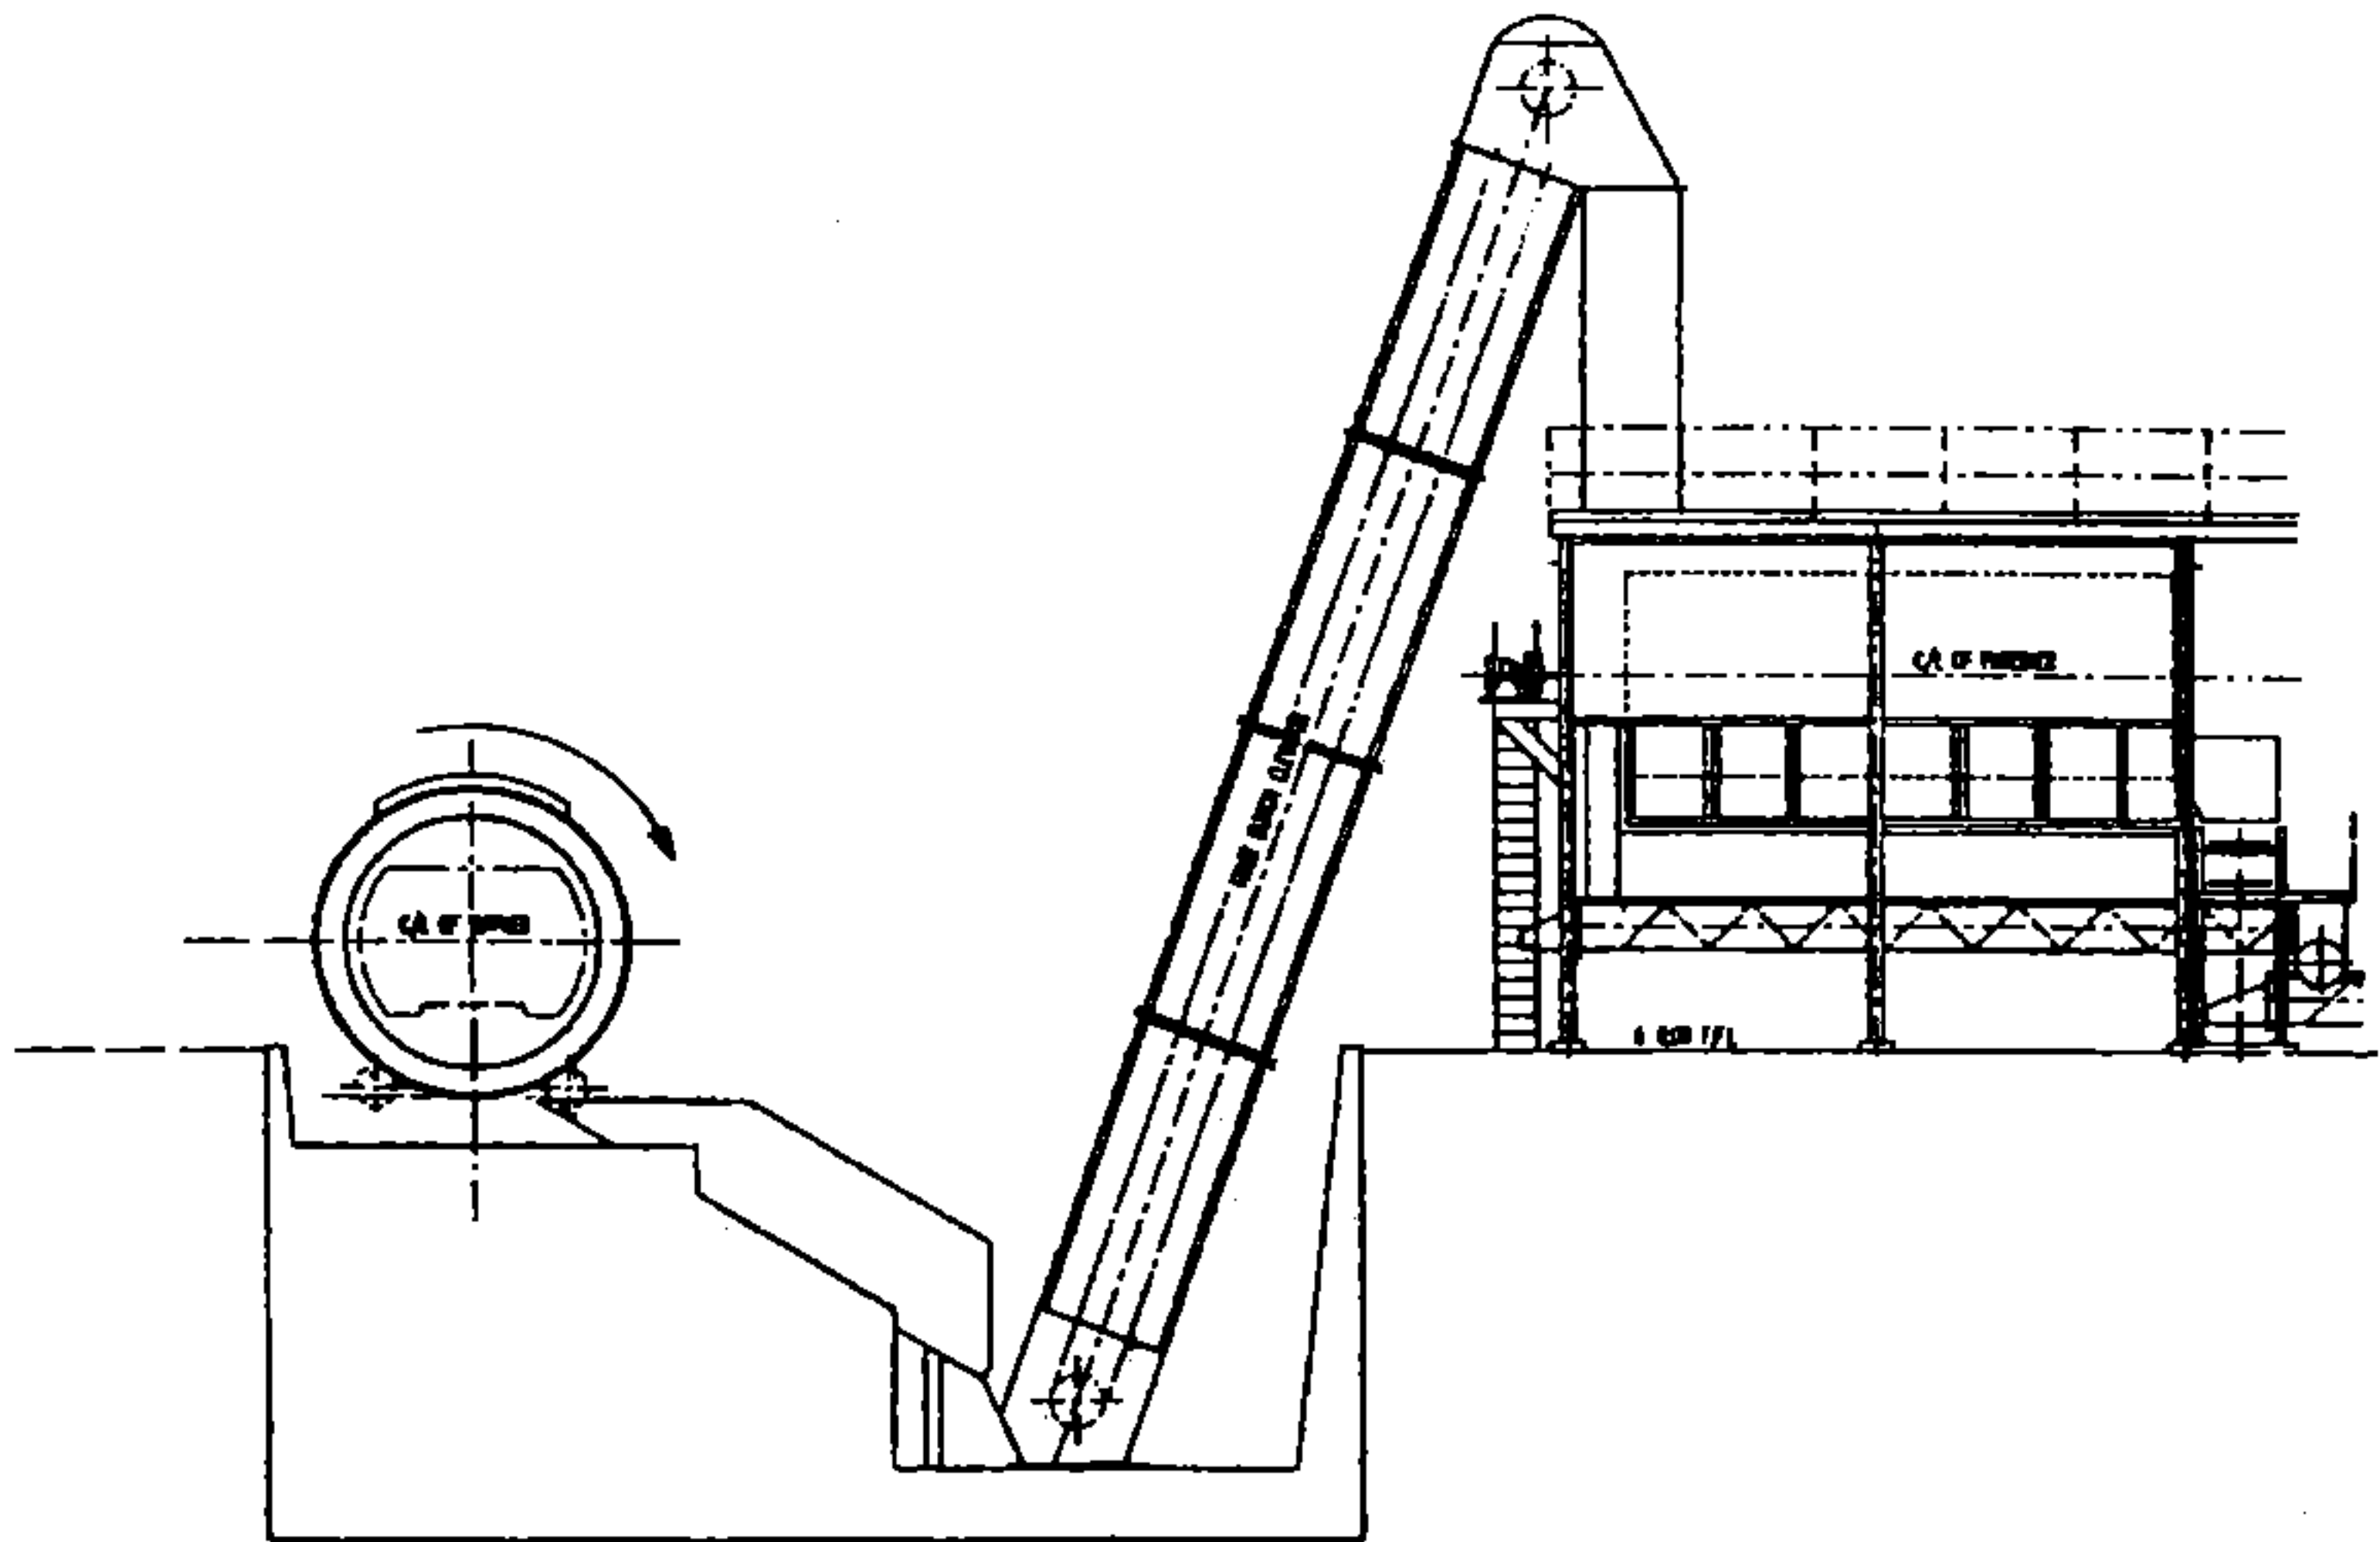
Tipper with fruit bunch elevator (Note: Inclination of elevator).
